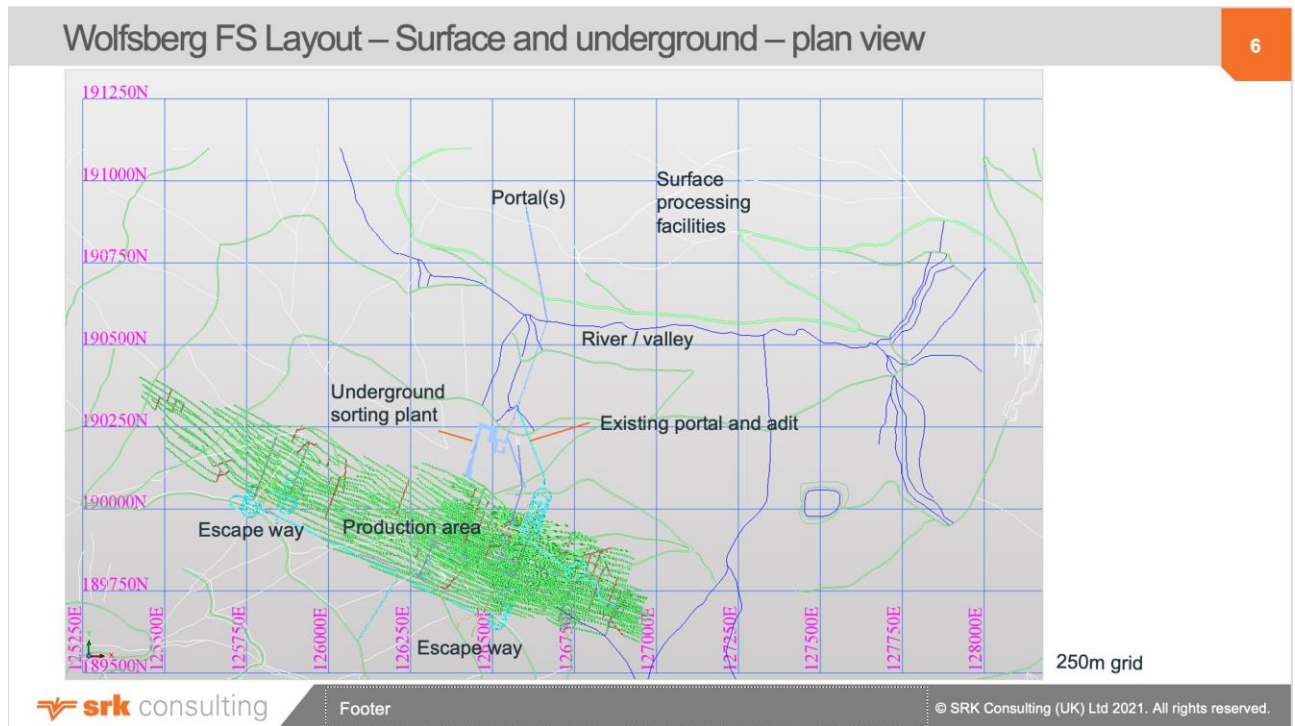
Draft DFS Layout - Surface & Underground - plan view
